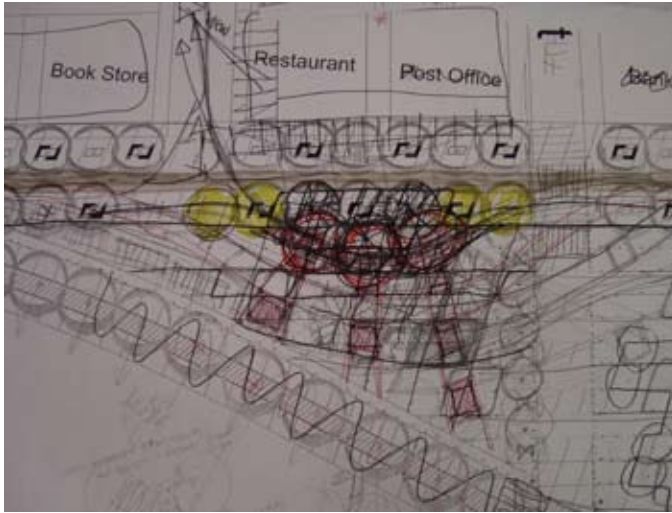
Existing Buildings at Masterplan level (Not to Scale, Author, 2009)
